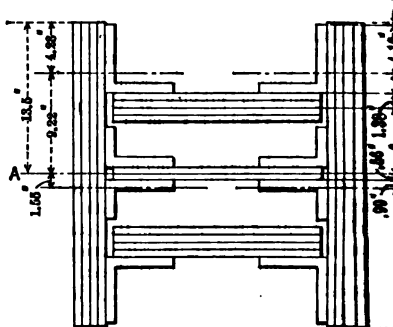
Moment of Inertia of Cross-section of web Plate-and-angle Box Column
